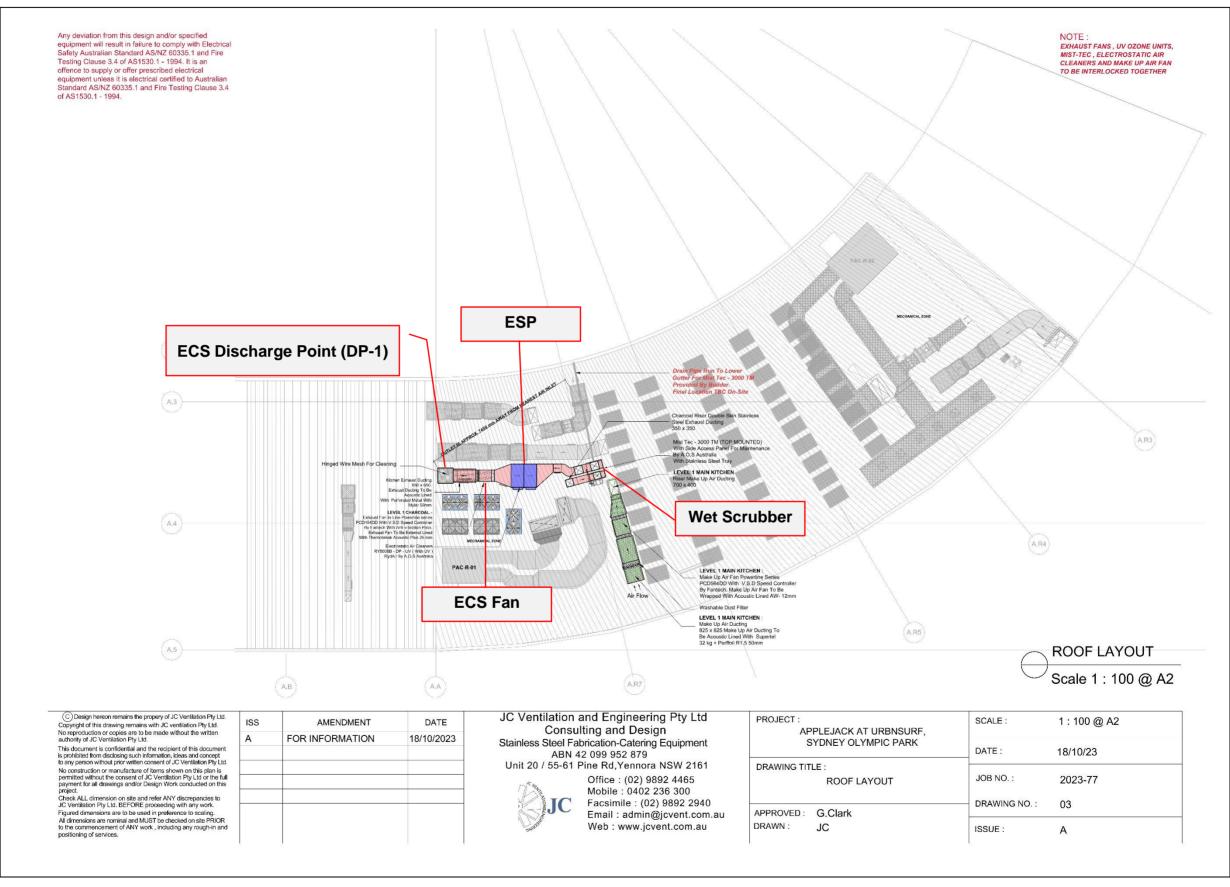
Roof layout at Proposed Development (Source: JC Ventilation)
